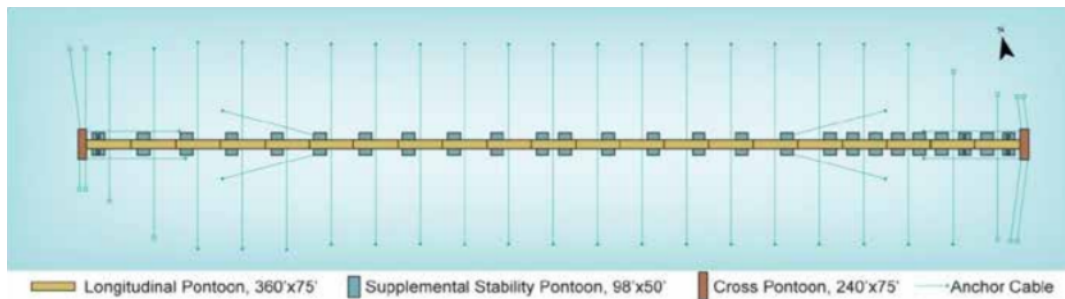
Pontoon and cable configuration for the new Evergreen Point Bridge, illustration (Washington State Department of Transportation, 2017)
